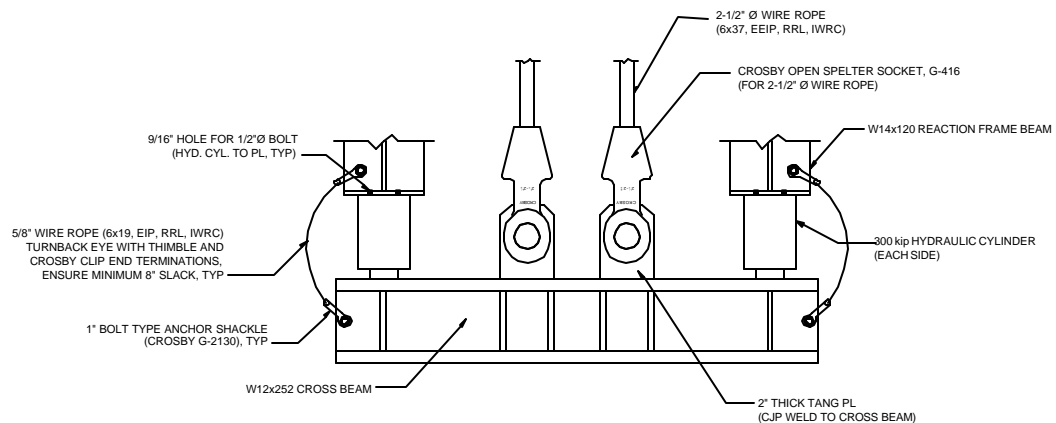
Setup for Bollard Test - Cross Beam Assembly
